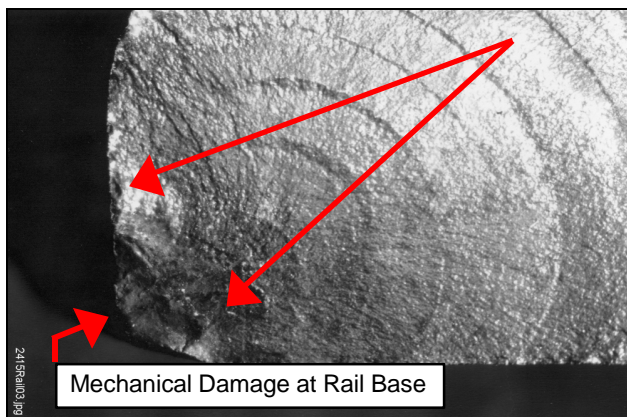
Fatigue Fracture at Rail Base Corner, Corus Test Rail, 91 MGT
